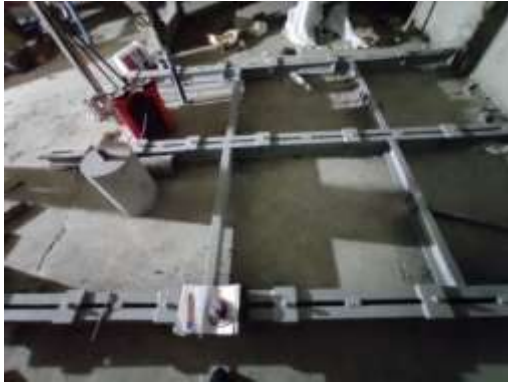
Scheme for strengthening the floor slab between the 10th floor and the technical floor. Photo by Andrii Zabrodskyi
